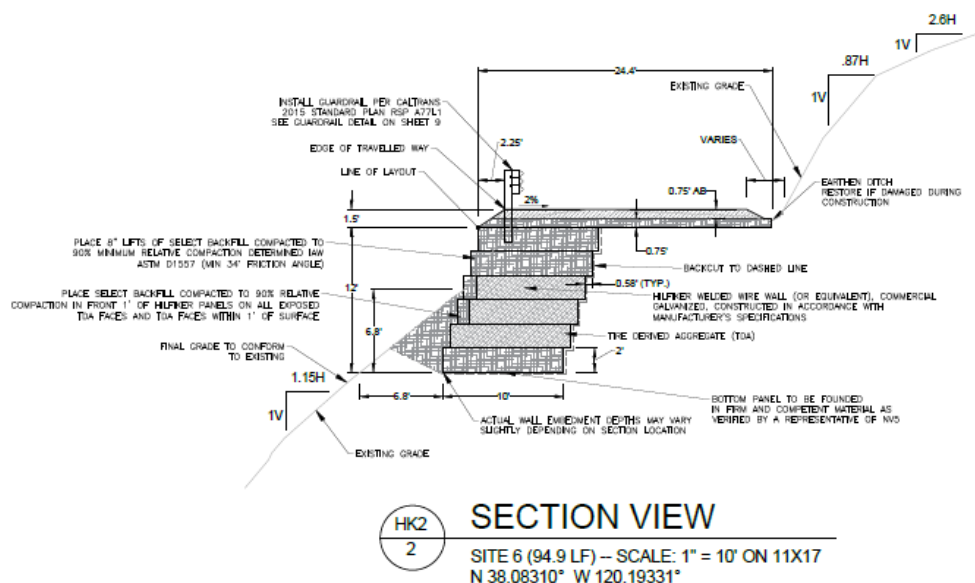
Elevation View of the MSTDA Wall at Italian Bar Road Site 6
